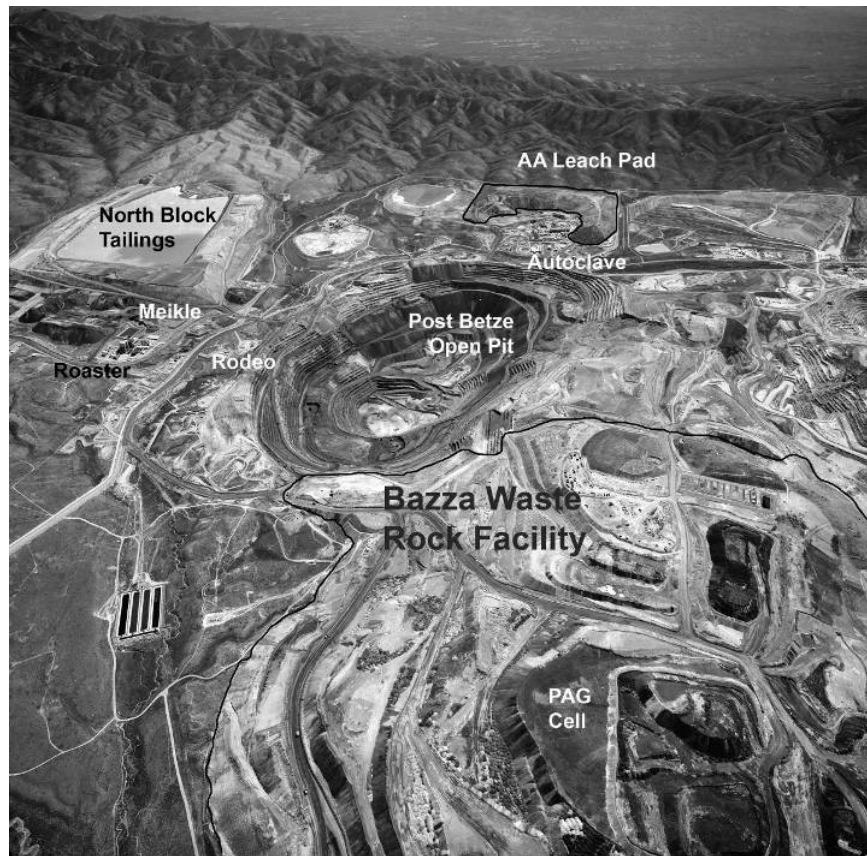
Aerial photo of the Barrick Goldstrike Mine looking east.
